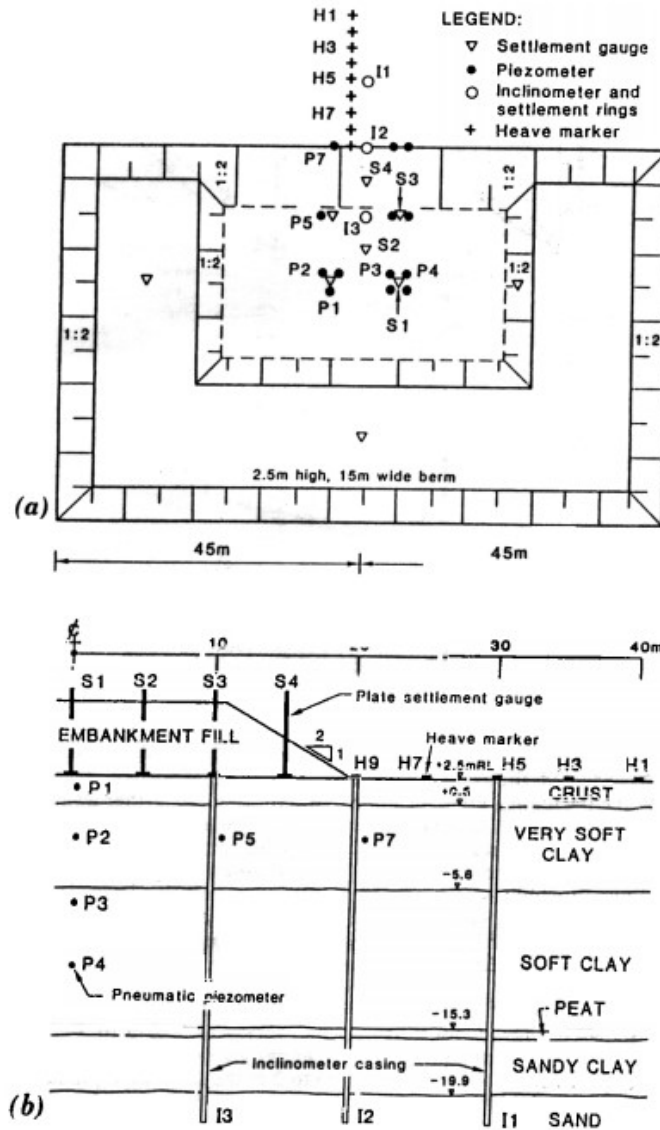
Muar Test Embankment Plan and Elevation, from Indraratna et al. (1992)
